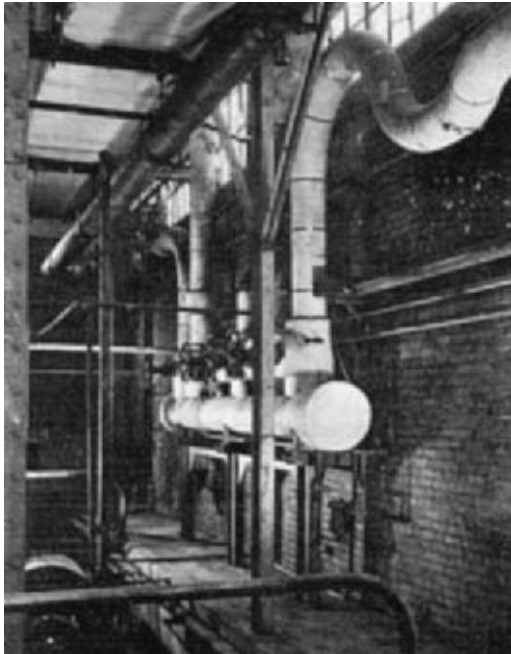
Steam header in industrial plant. (Courtesy of Valve World.)
